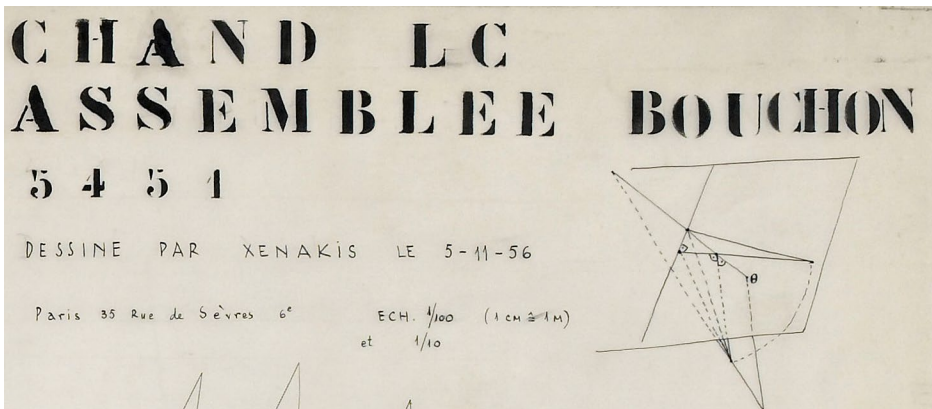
Detail of the drawing 5451 for the Parliament of Chandigarh, "dessiné par Xenakis" 5-11-1956. Courtesy of Fondation Le Corbusier.
